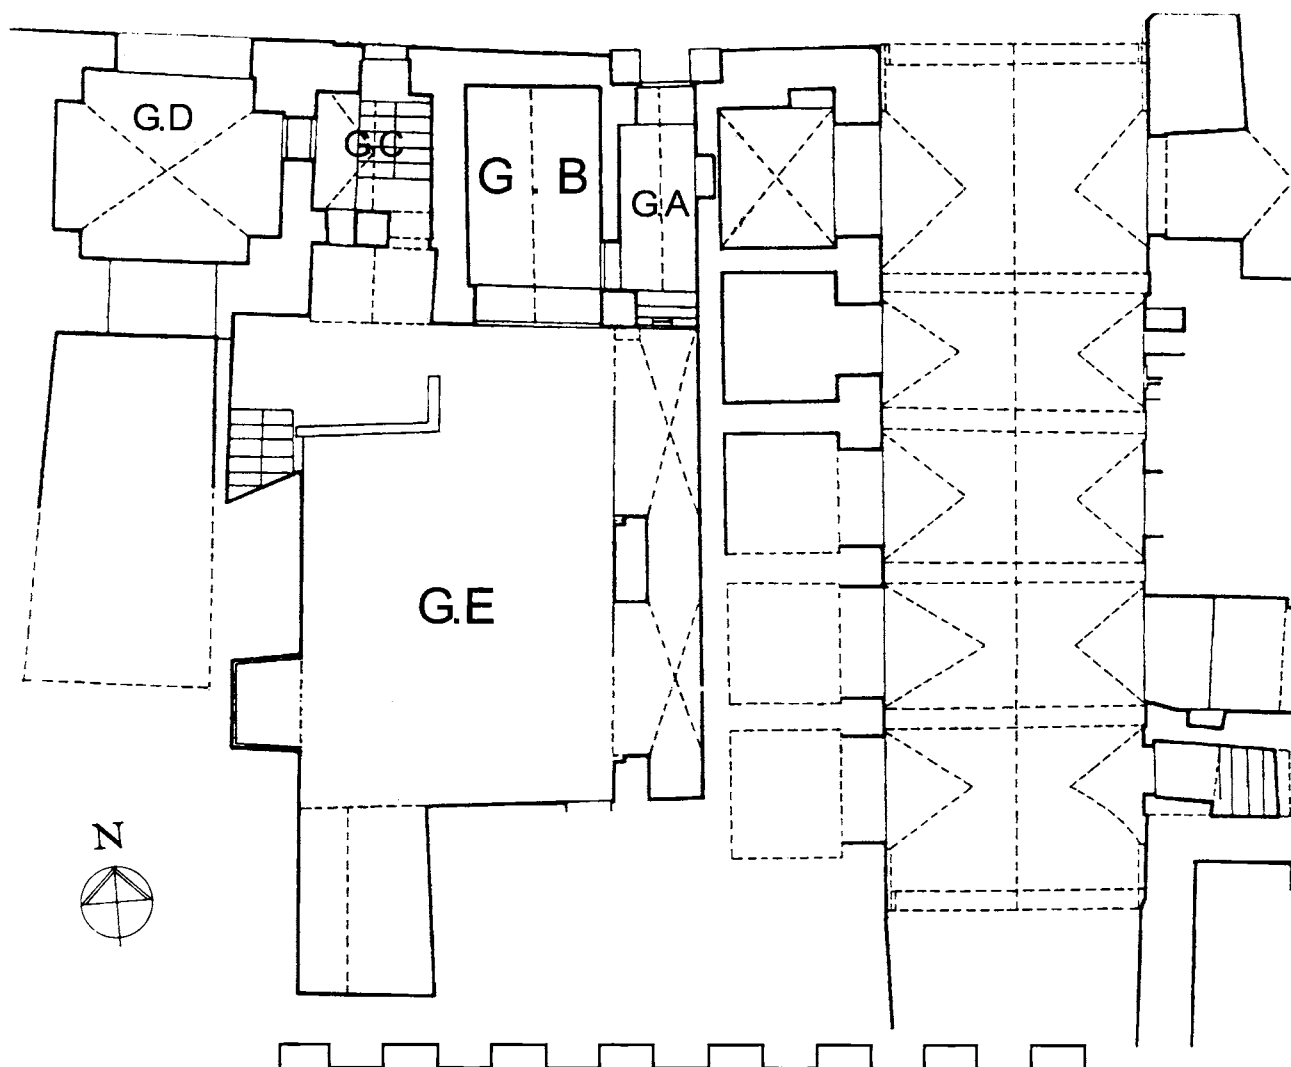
Ribat Bairam Jawish, ground floor plan.
